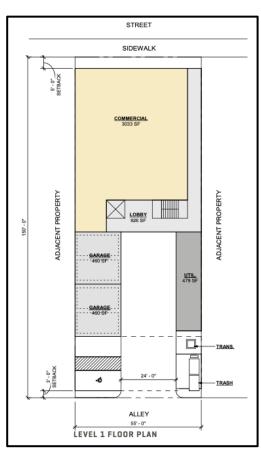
Mixed-Use Model Ground Floor (Holst Architectural Study, Page 13)
